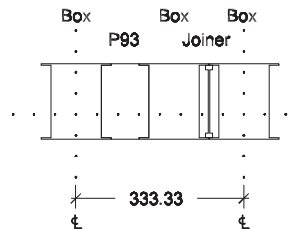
Typical Wall Adjustment using Joiner/Box/Panel 93
